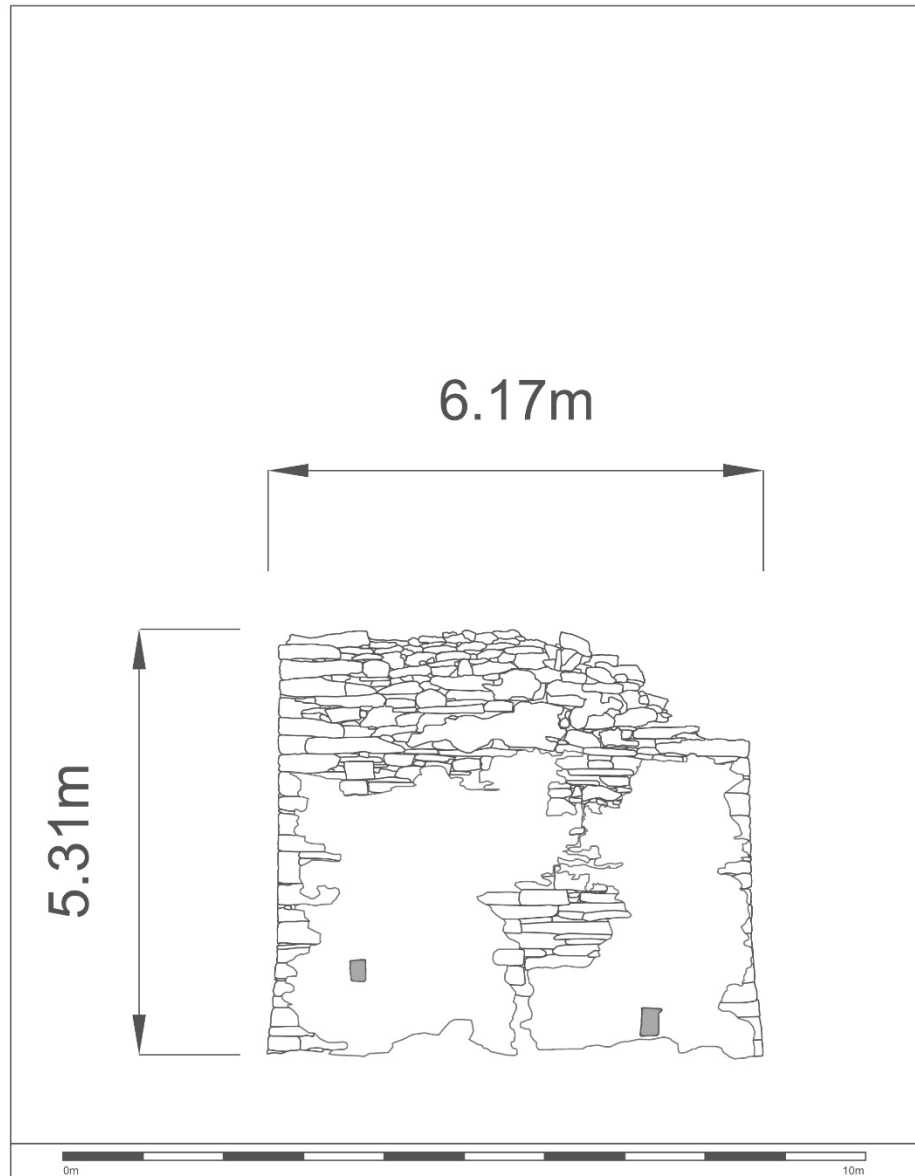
External elevation of the east wall of Saddle Hill Signal Tower. The two chutes passing through the wall into the semi-basement level are shown in grey.
